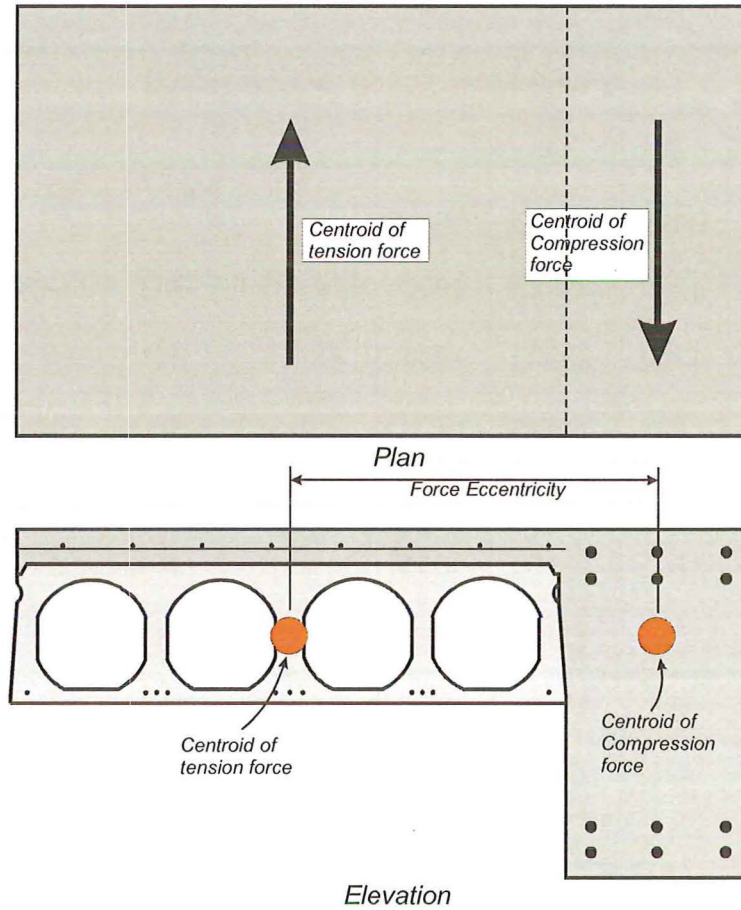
Plan and elevation showing the offset compression and tension forces that cause the central column to displace laterally.
